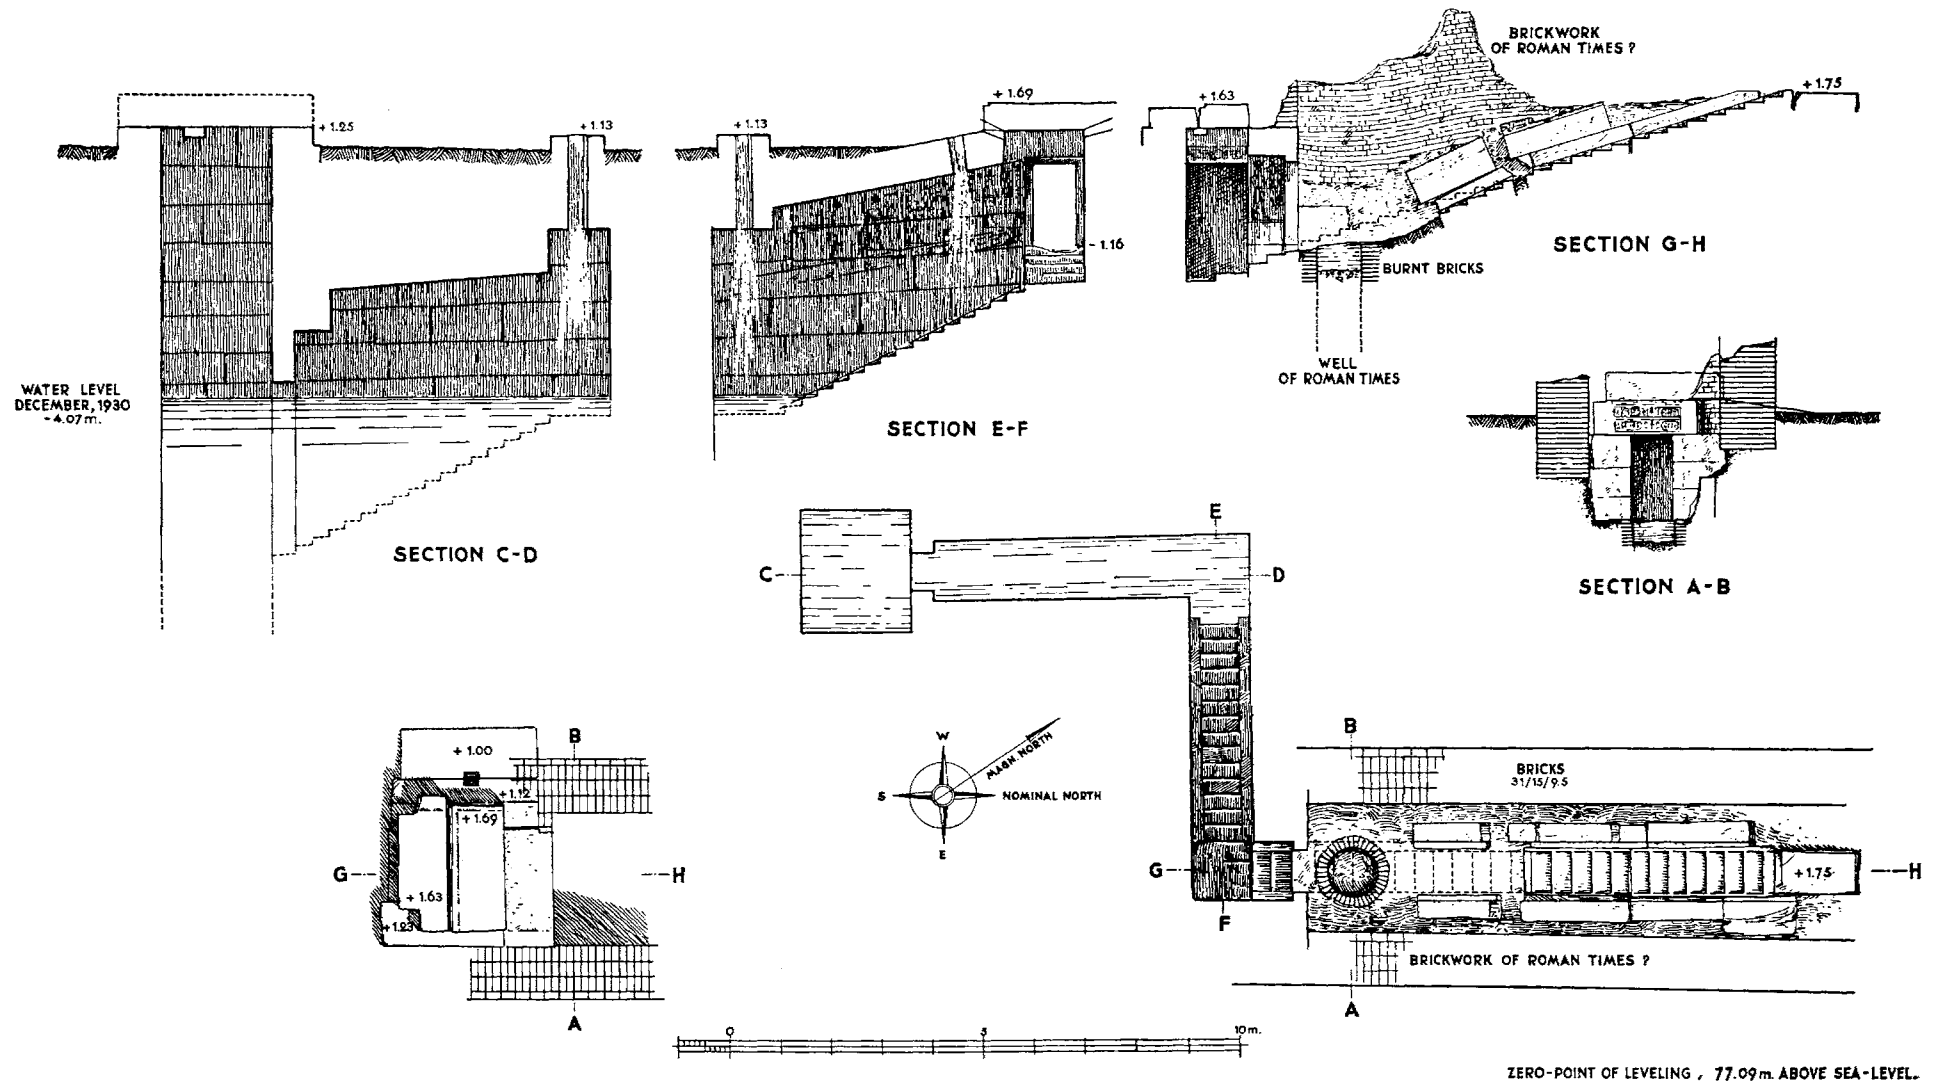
PLAN AND SECTIONS OF THE WELL IN COURT R
